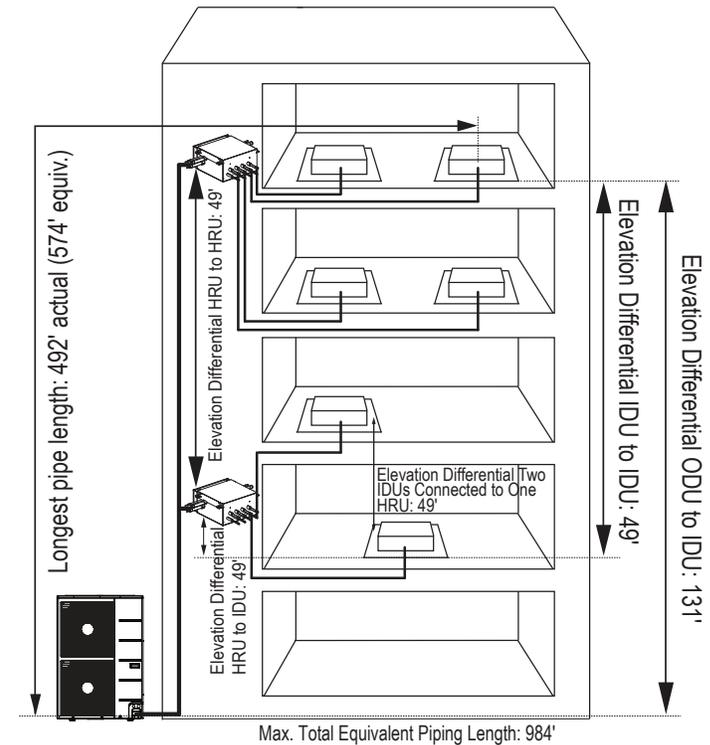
Typical Multi V S with LGRED Heat Recovery System Building Layout Listing the Piping Limitations — When the Outdoor Unit is Below the Indoor Units.
